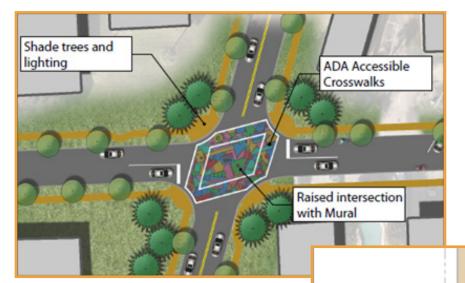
Proposed intersection improvements at Ridgewood Ave and Fillmore Ave
